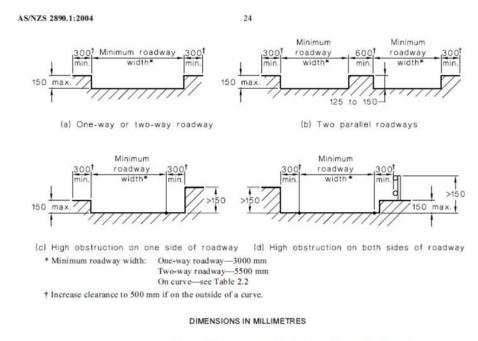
CIRCULATION ROADWAY AND RAMP CROSS SECTIONS
